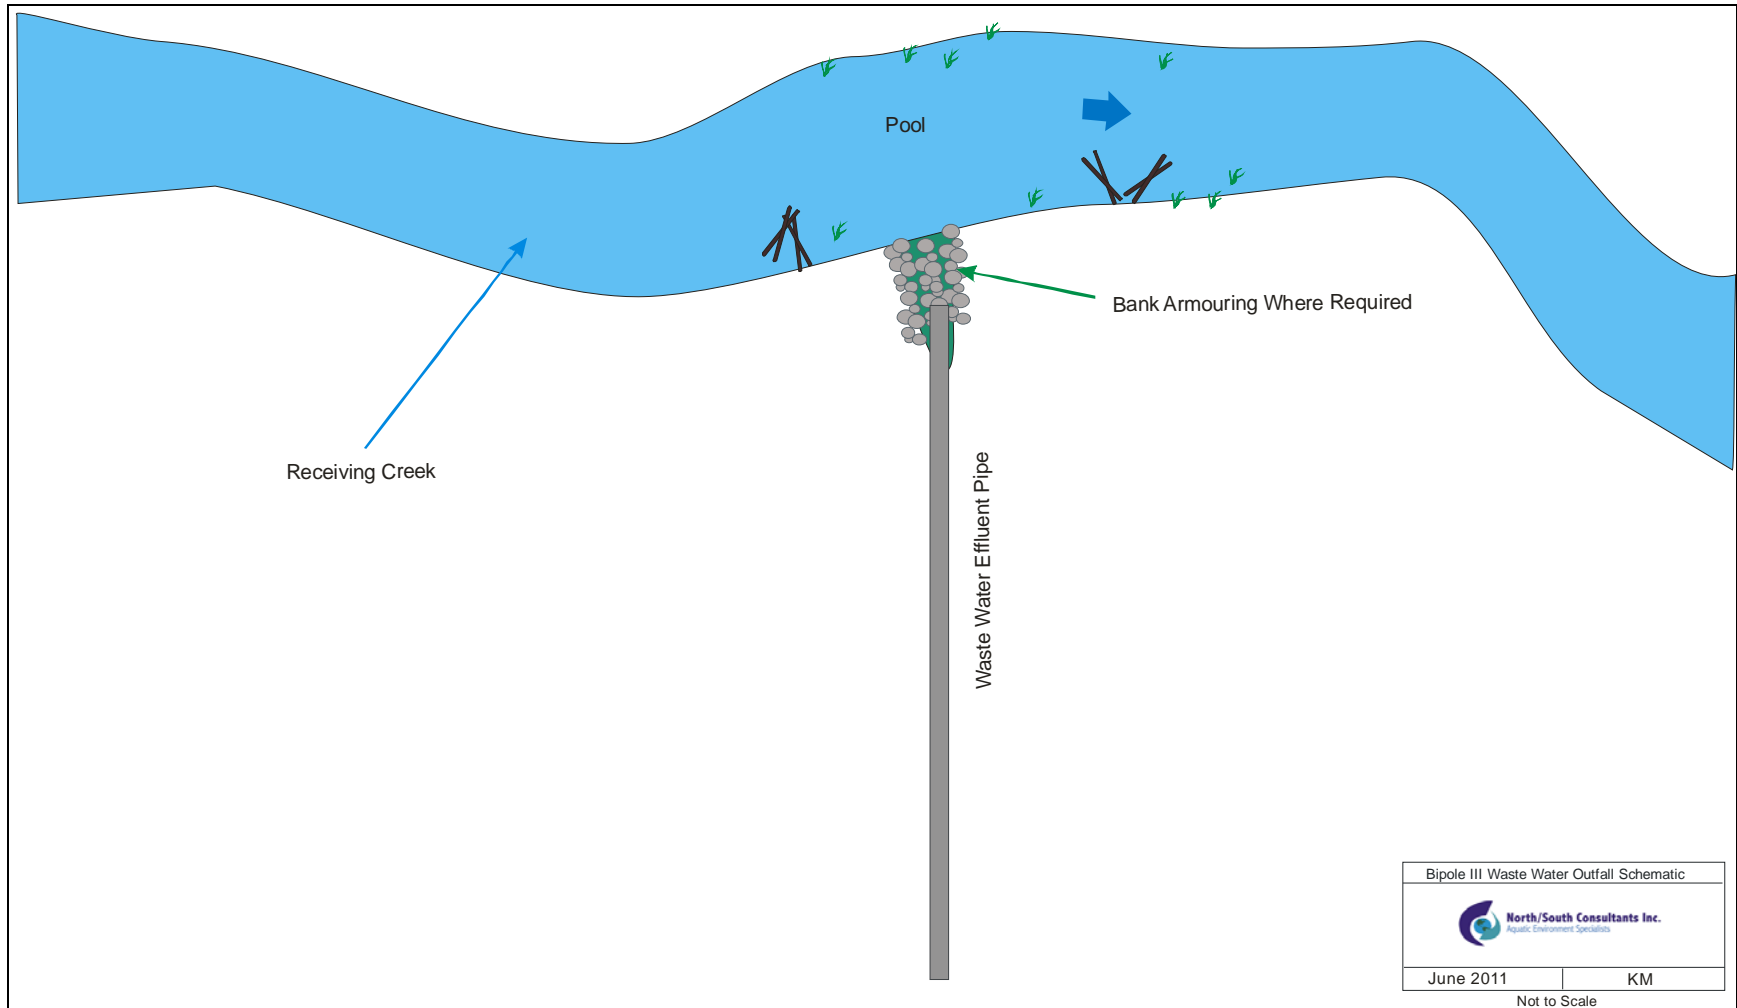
Schematic of a constructed waste water effluent pipe terminating at the receiving watercourse bank.
